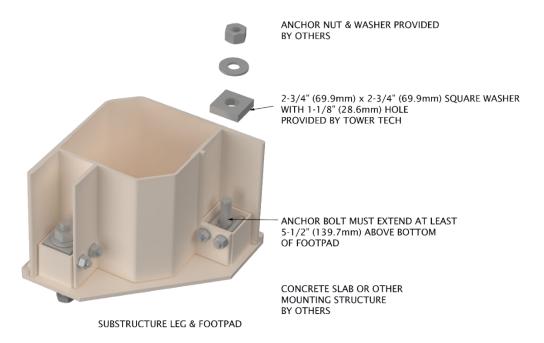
Installation Detail for Sub-Structures Taller Than One Foot (>30.5 cm)
